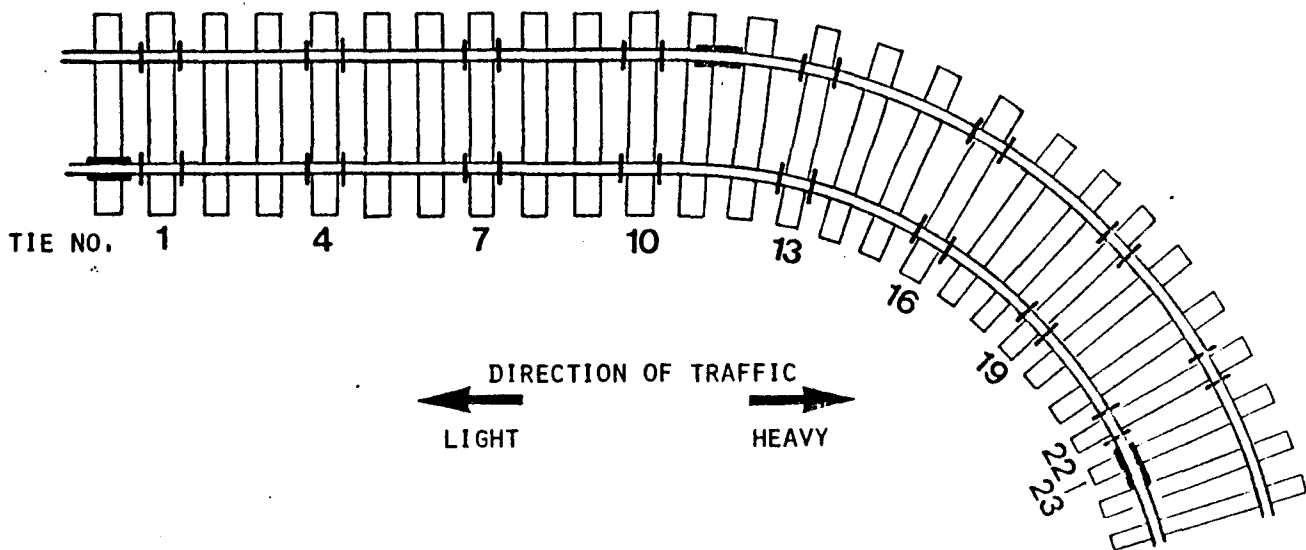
RAIL ANCHOR SPACING FOR 39'
